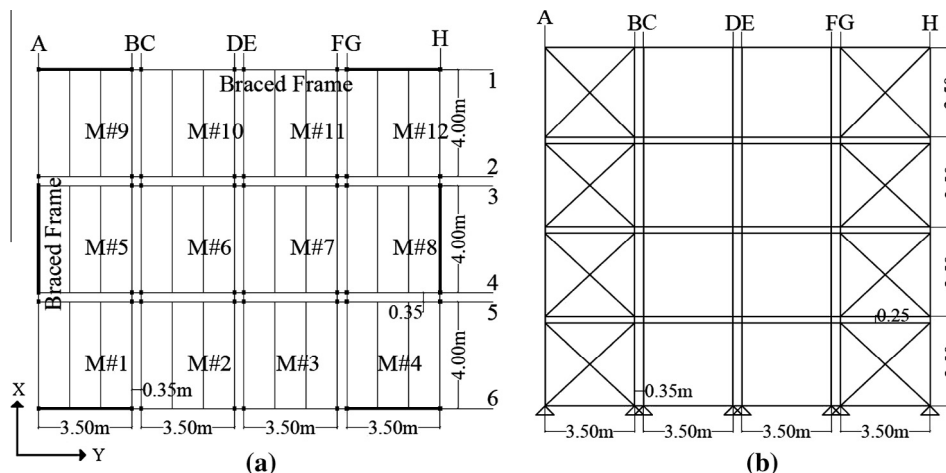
4-story MSB braced frame (a) floor plan and (b) elevation of frame 1 or 6.
